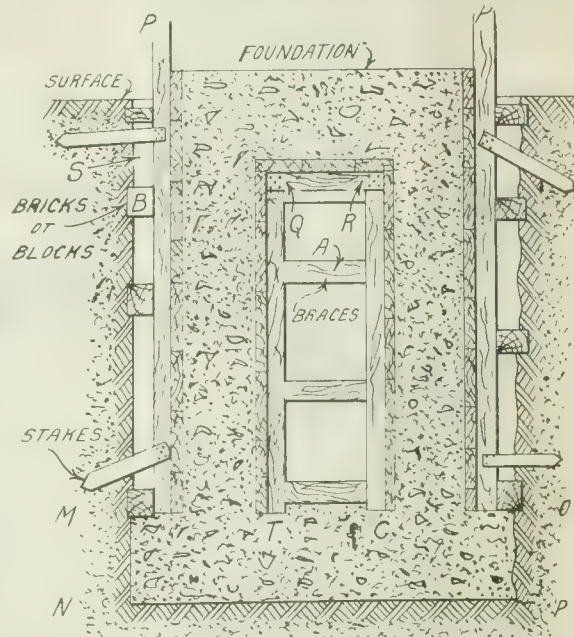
FORM CONSTRUCTION FOR A PLANER FOUNDATION OF CONSIDERABLE DEPTH SHOWING METHOD OF SAVING CONCRETE BY MAKING FOUNDATION HOLLOW
